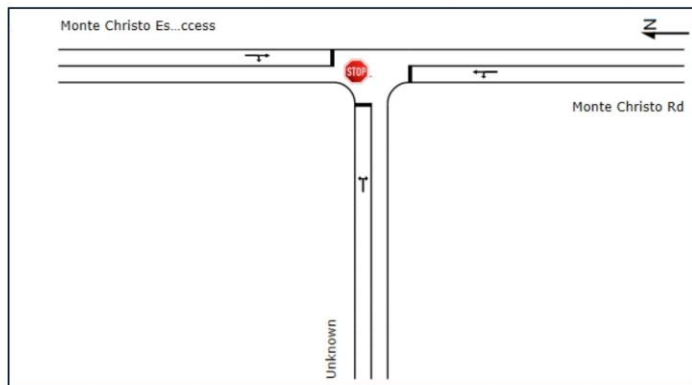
Monte Christo Road and Monte Christo Estate Existing Intersection Layout
